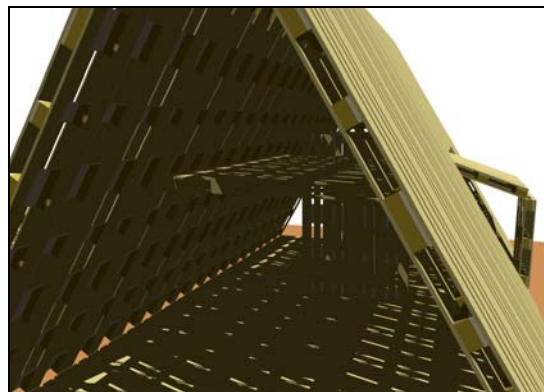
Rendering of TPH© house frame. The frame structure consists of Euro-pallet boards, applicable in several contexts as roof, floors and wall framing and embraced by plywood strips and tensile metal or plastic straps depending of the final skin. Source: Suau-Teixido.
